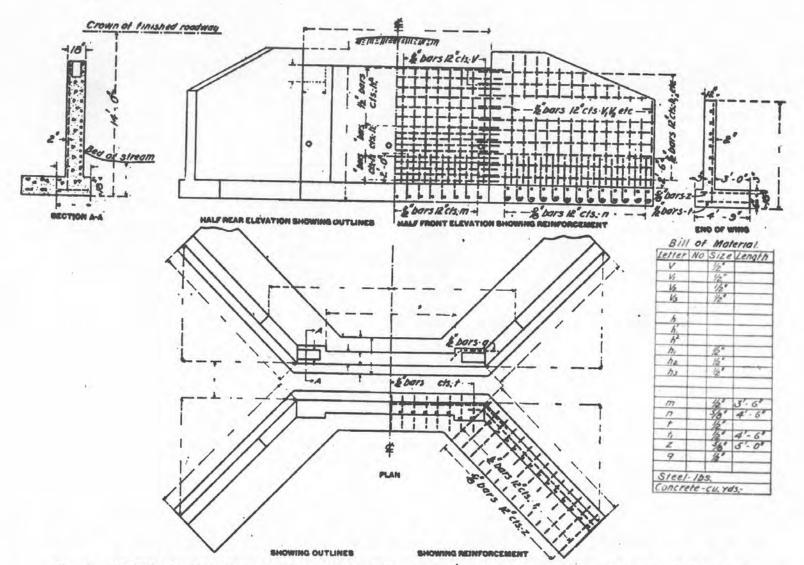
Typical standard plan of reinforced concrete abutments for girder bridges. Cantilever type wings.
